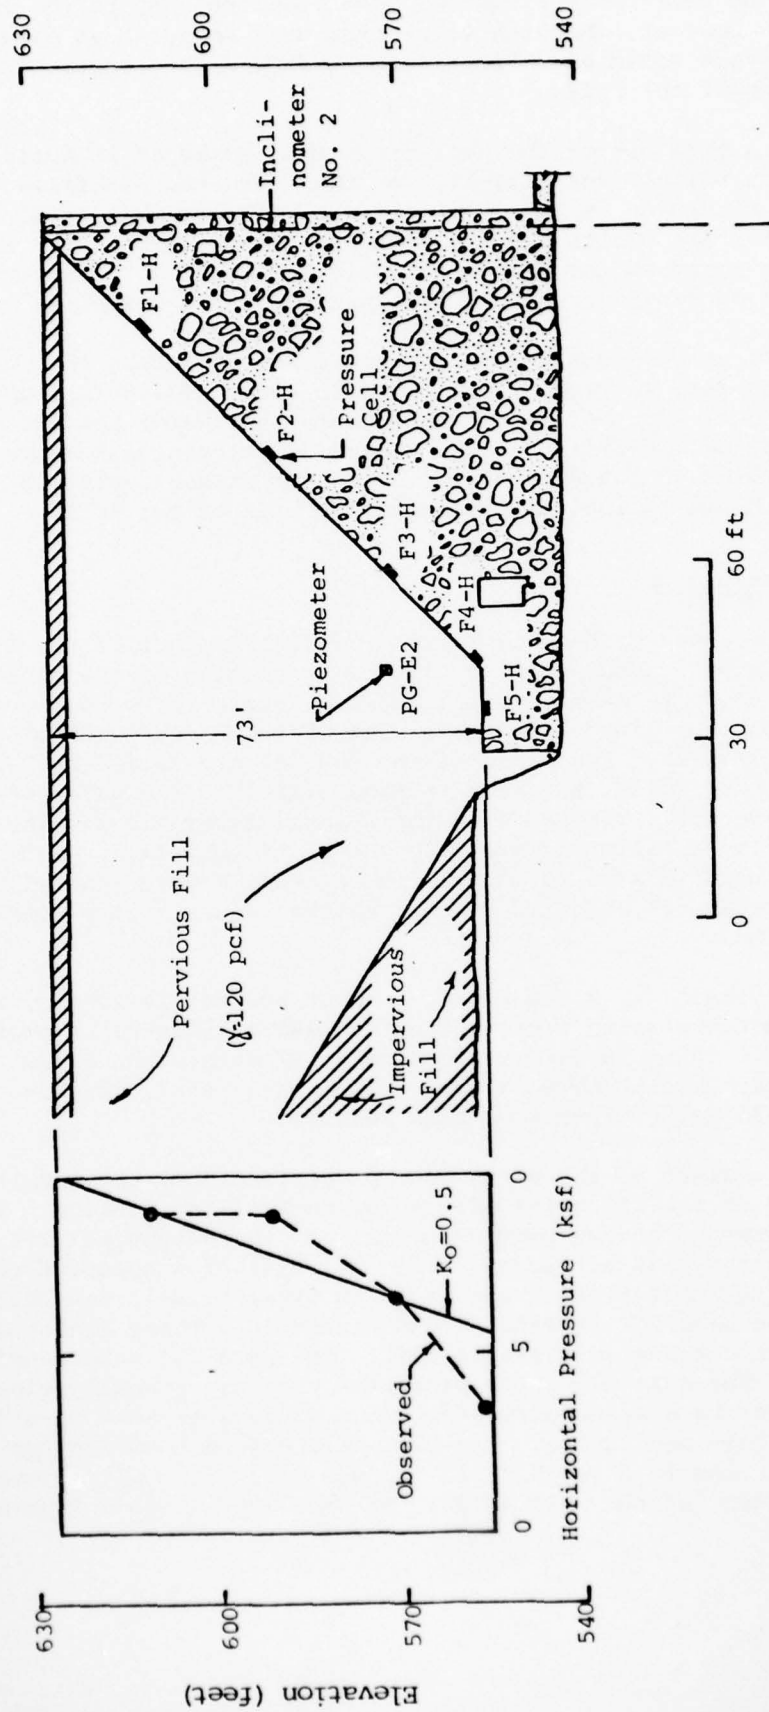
TOTAL EARTH PRESSURES AT END OF CONSTRUCTION, BLOCK F, WEST POINT DAM
